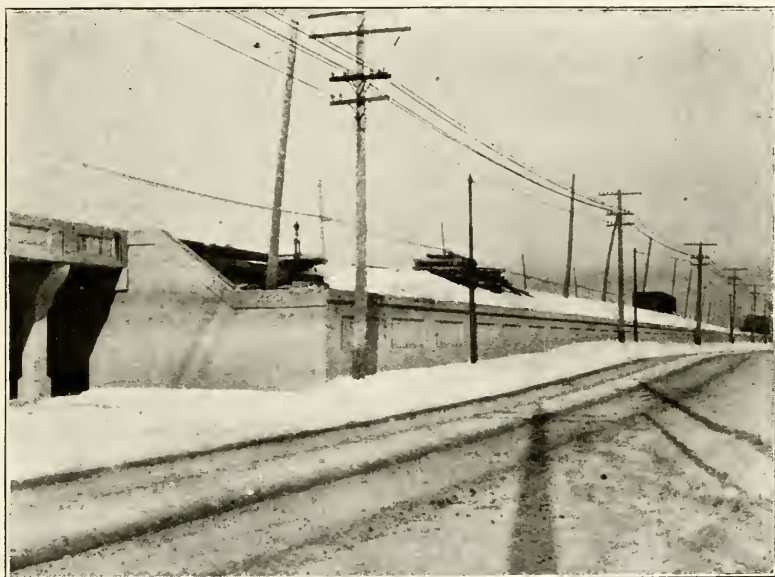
VIEW OF RETAINING WALL ALONG CHICAGO AVENUE.
